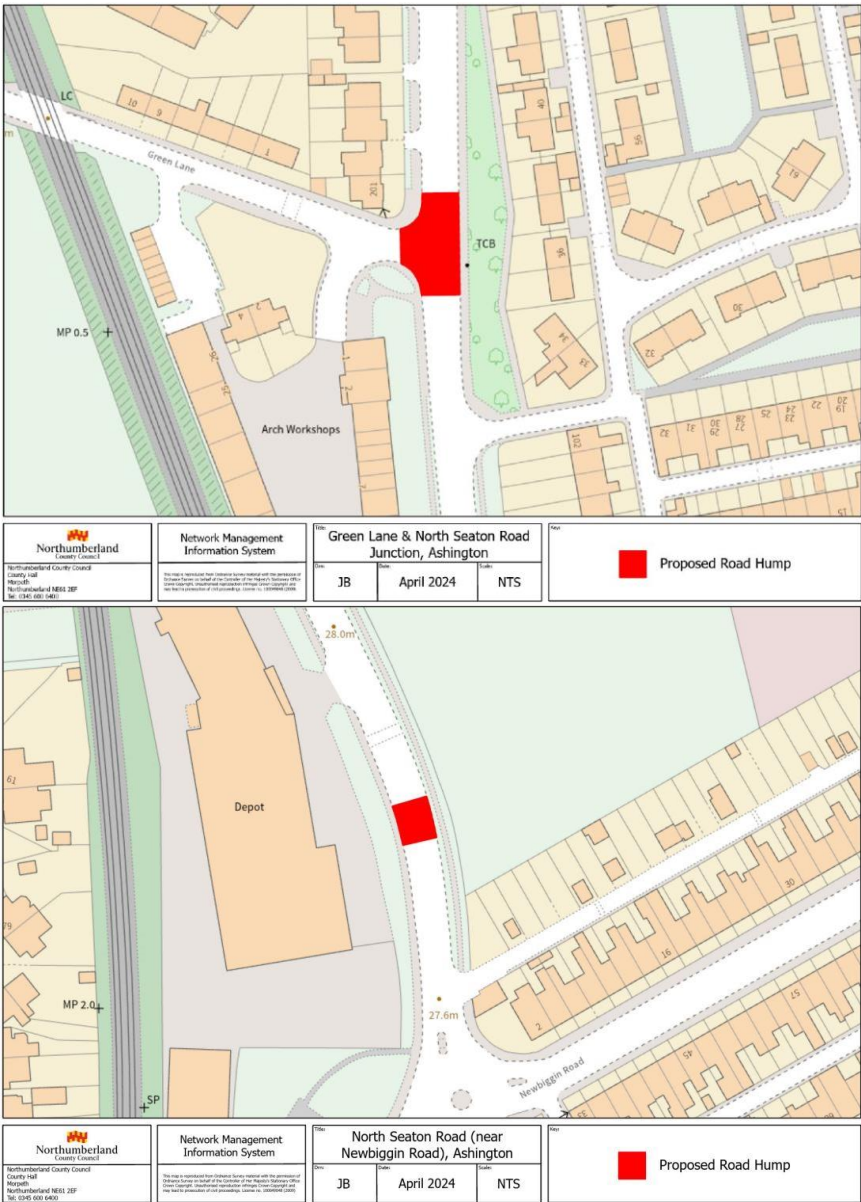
Proposed road humps at the A196 North Seaton Road and its adjoining roads
